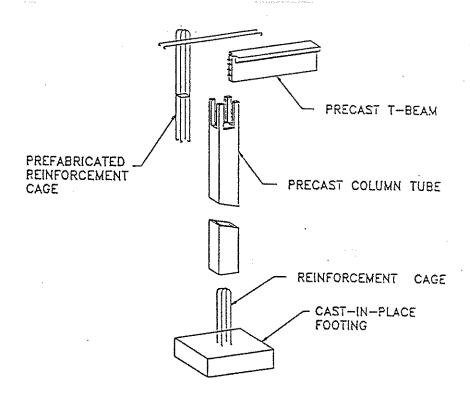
Footing-to-column and beam-to-column connection. Tongue of tee beam is dropped into slot of precast column.
